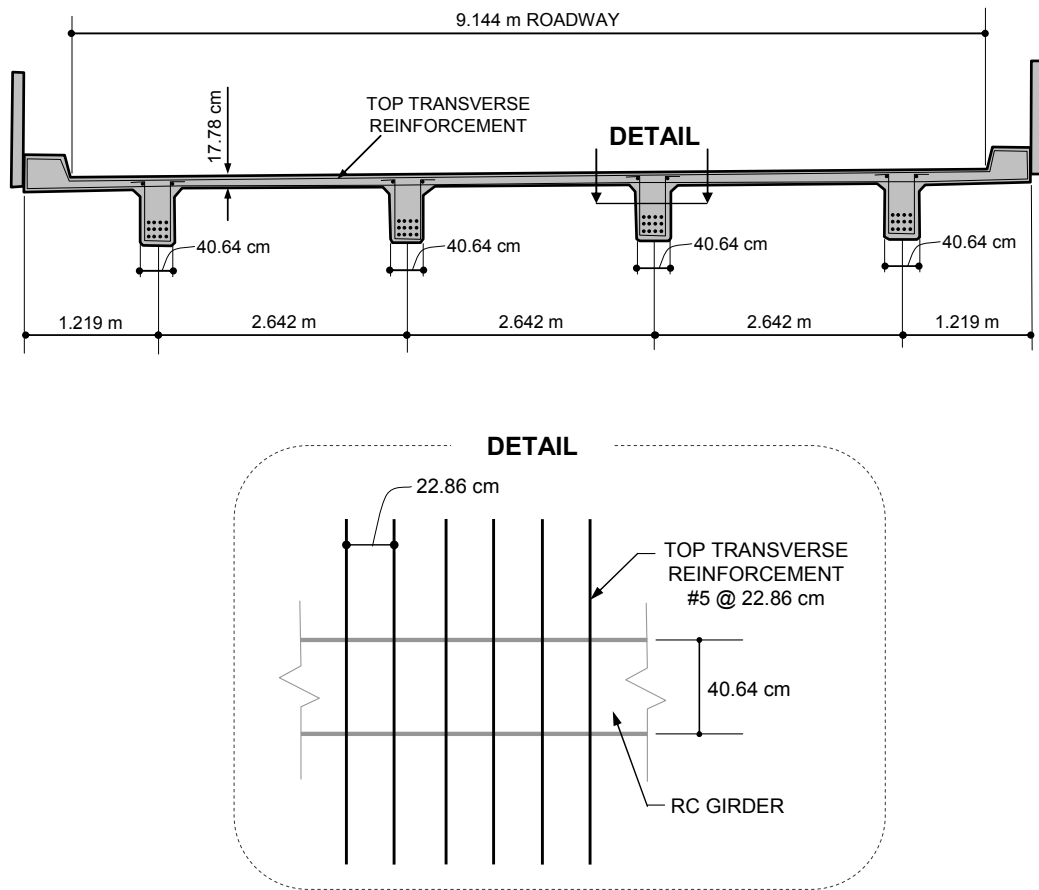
Cross-sectional view and layout of top transverse reinforcement bars at end spans of E-17-HS (adapted from Akgül 2002)
